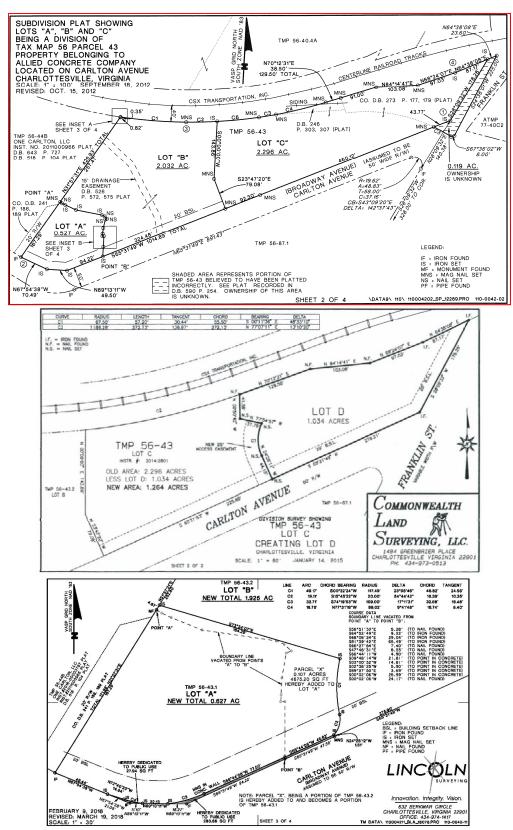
Existing Subdivision Plats CARLTON VIEWS PUD APPLICATION
